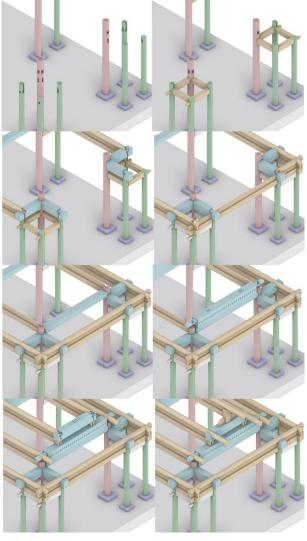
Construction process of the "seven purlin" stacked timber beam structure.
